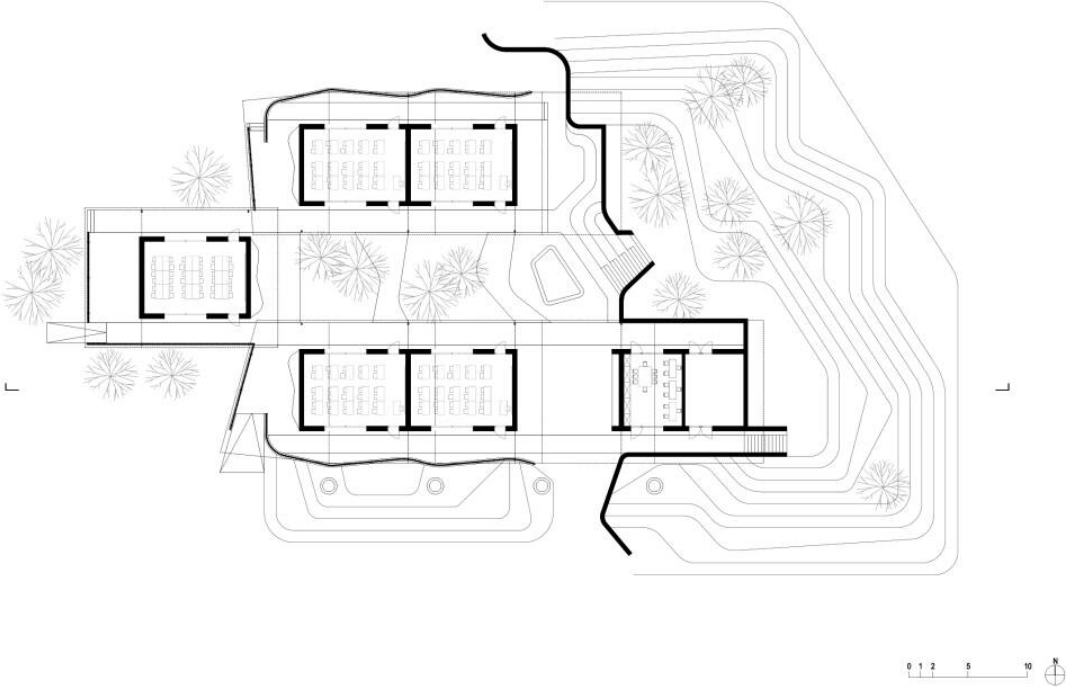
Floor Plan of Burkina Institute of Technology (2020)
